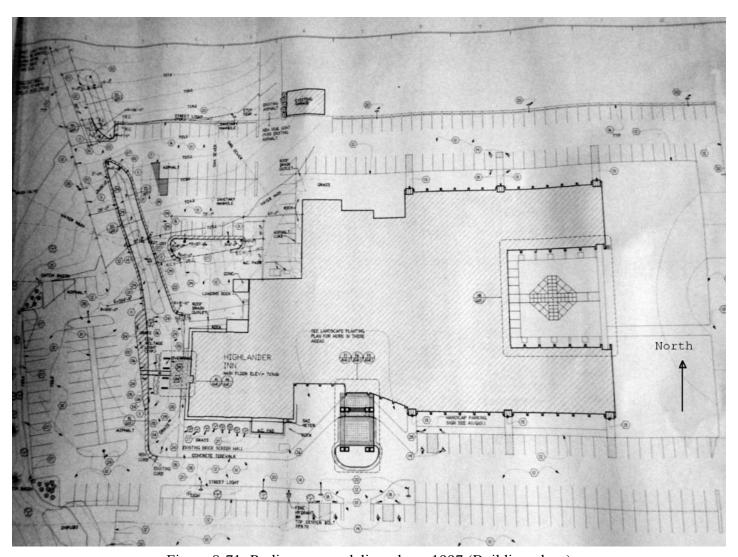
Radisson remodeling plans, 1997 (Building plans)
